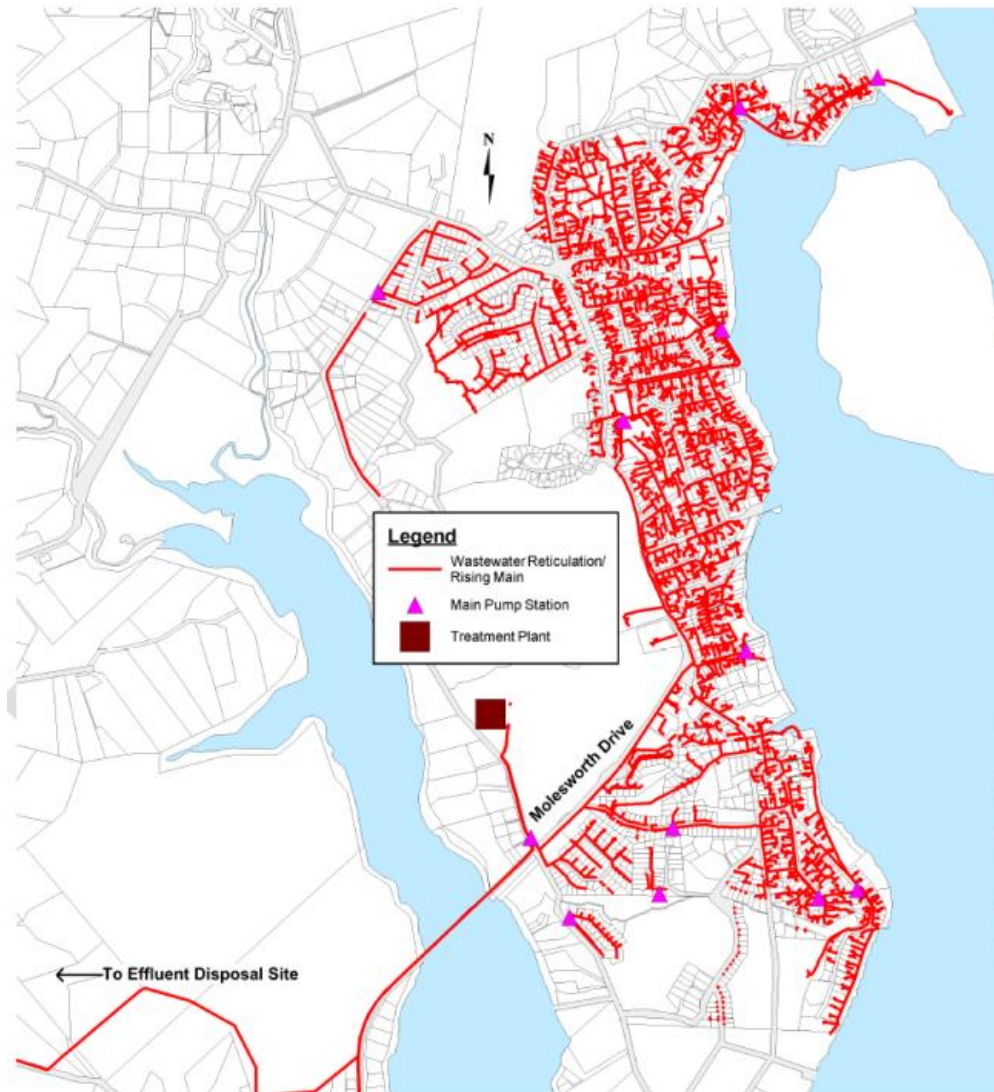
Existing wastewater network (KDC Asset Management Plan 2015)
